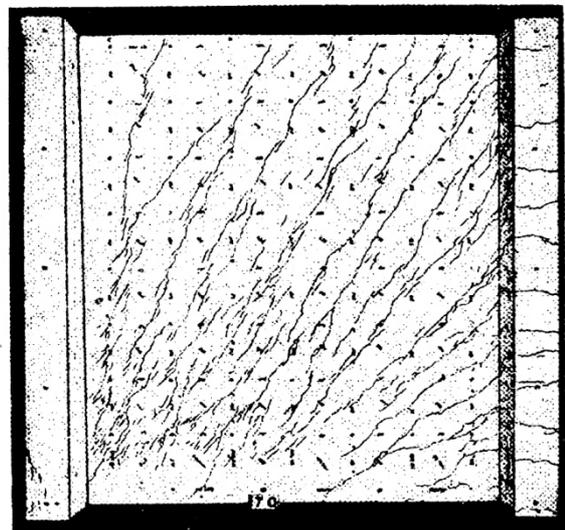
Cracking pattern for wall S2 tested by Maier and Thürlimann (1985) at first yielding of flange vertical reinforcement
